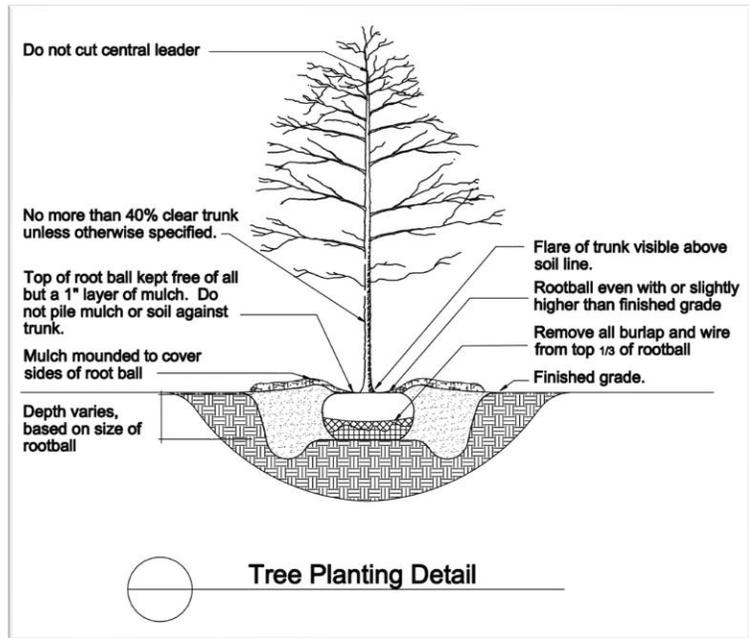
TREE PLANTING DETAIL FOR PARKING LOT ISLAND OR MEDIAN
